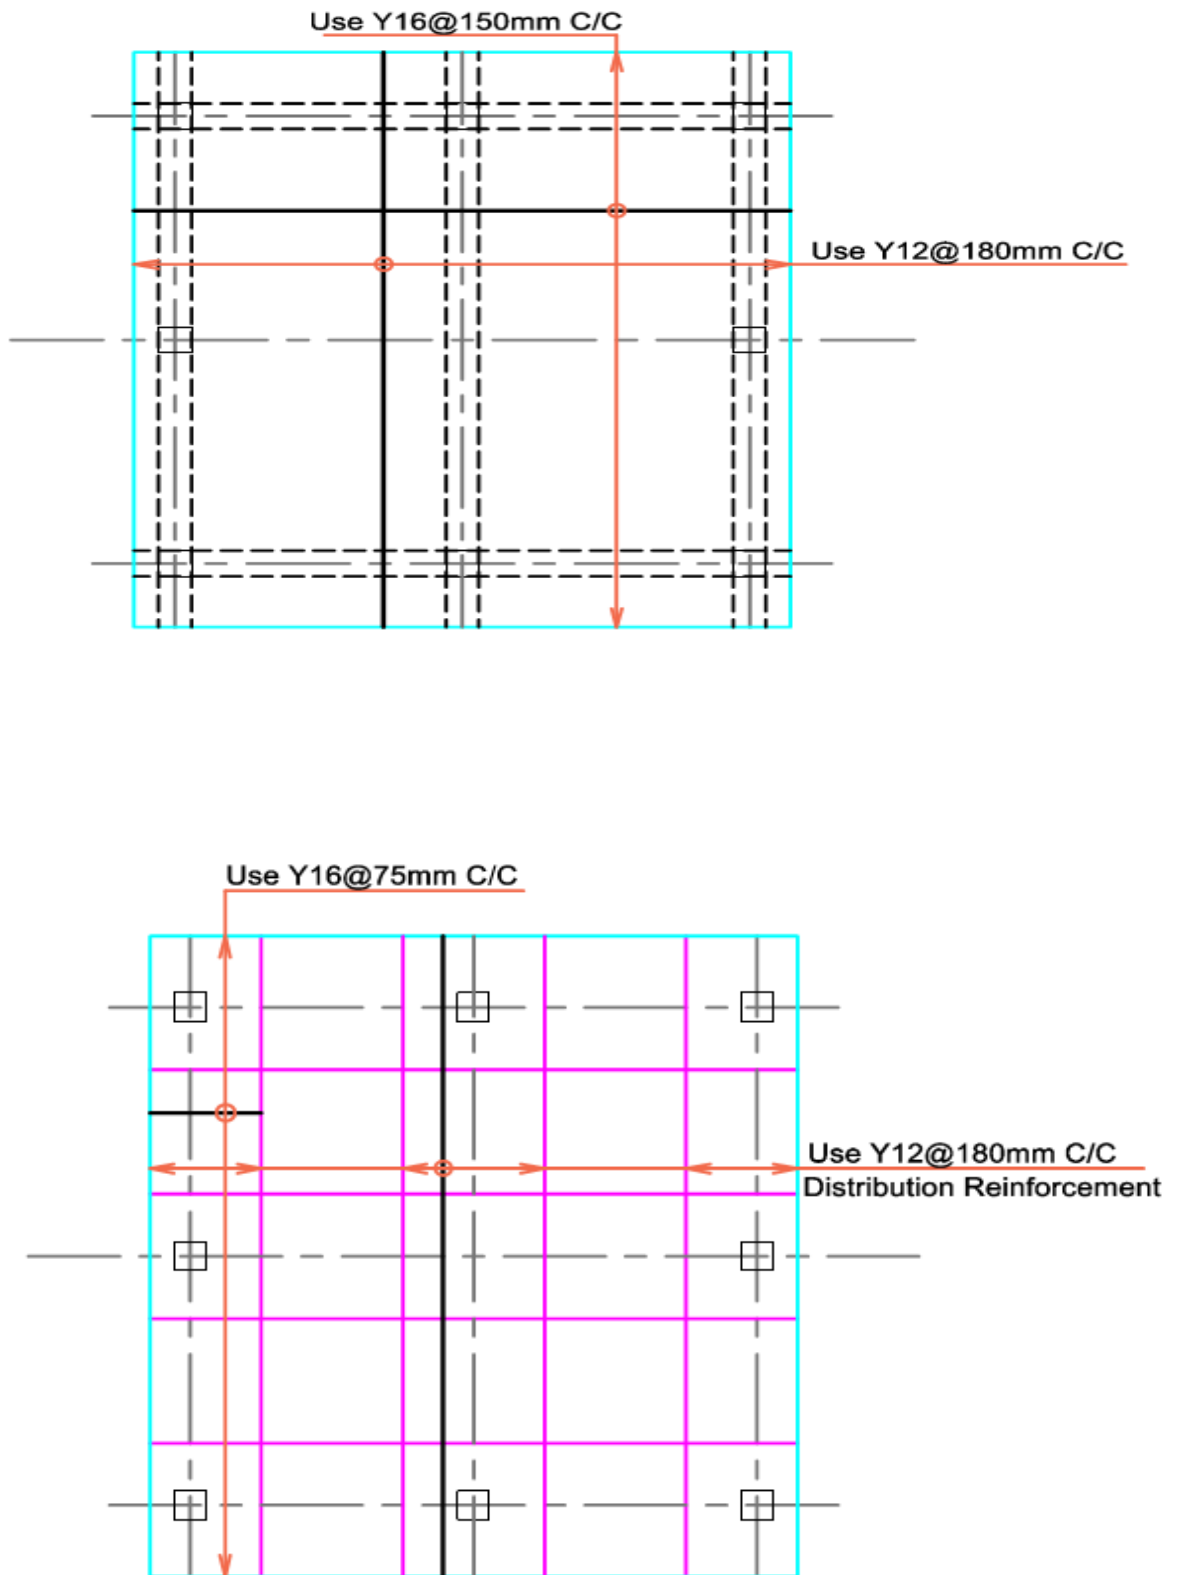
Rectangular water tank-Bottom slab structure drawing
